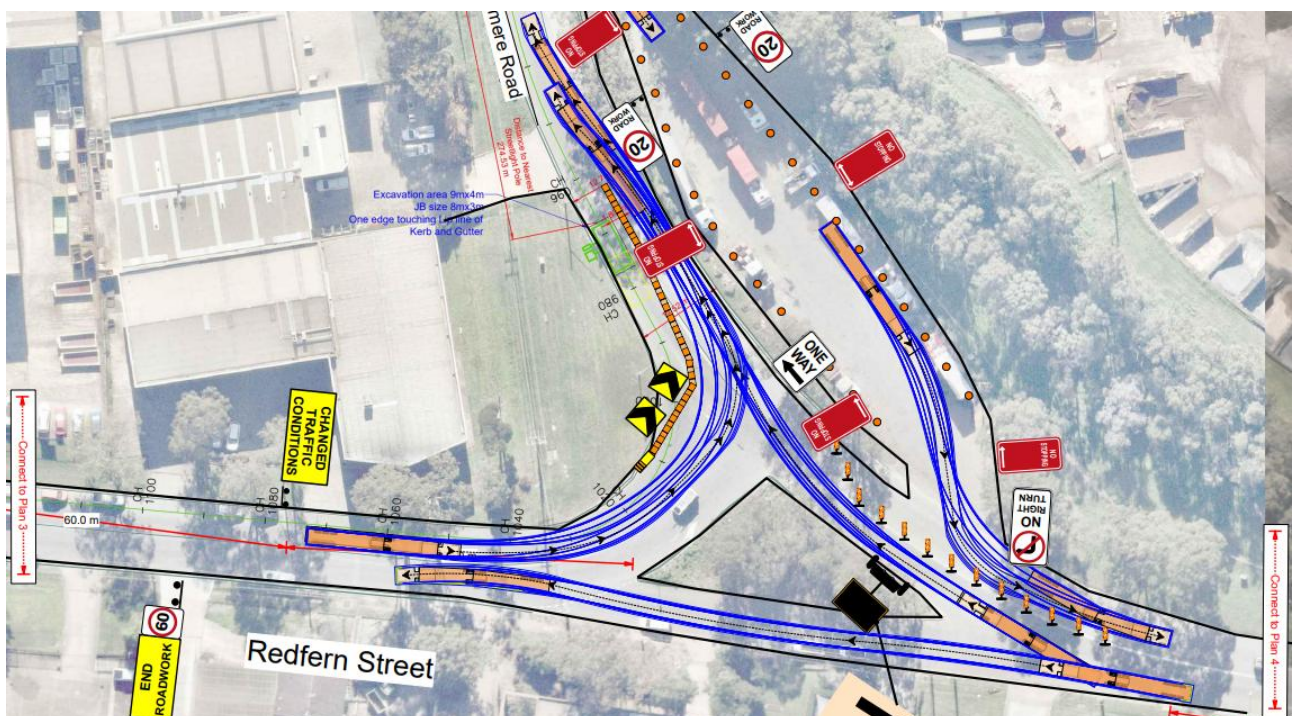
Proposed temporary traffic layout at Widemere Road (Stage 3).
